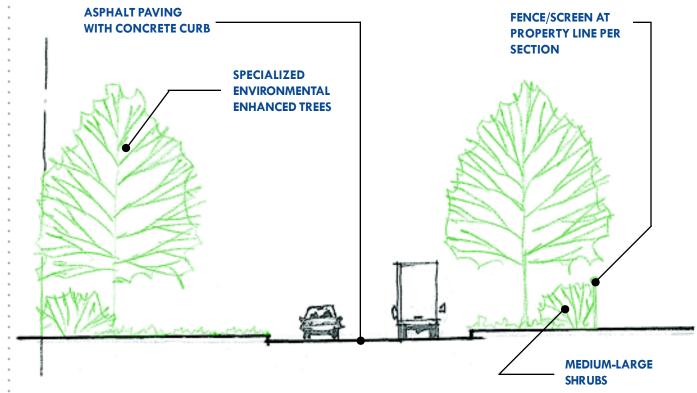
D ILLUSTRATIVE LANDSCAPE SECTION—
